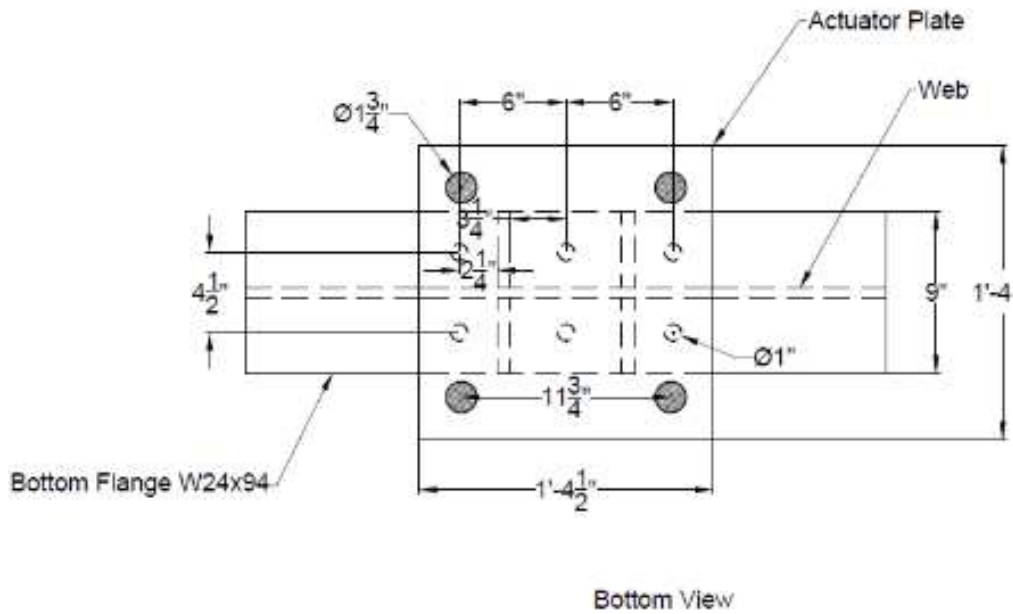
Actuator plate connections to bottom flange of top W24x94 beam
